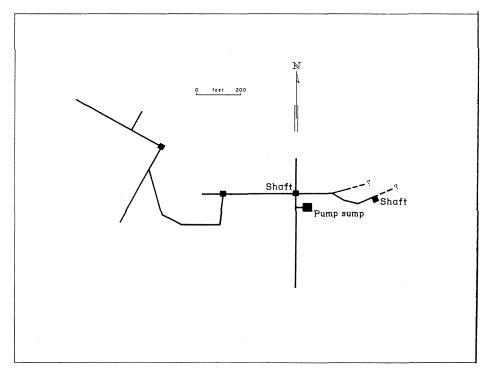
Plan of tunnel system at shaft 4, McBryde Sugar Co. pump 1.
